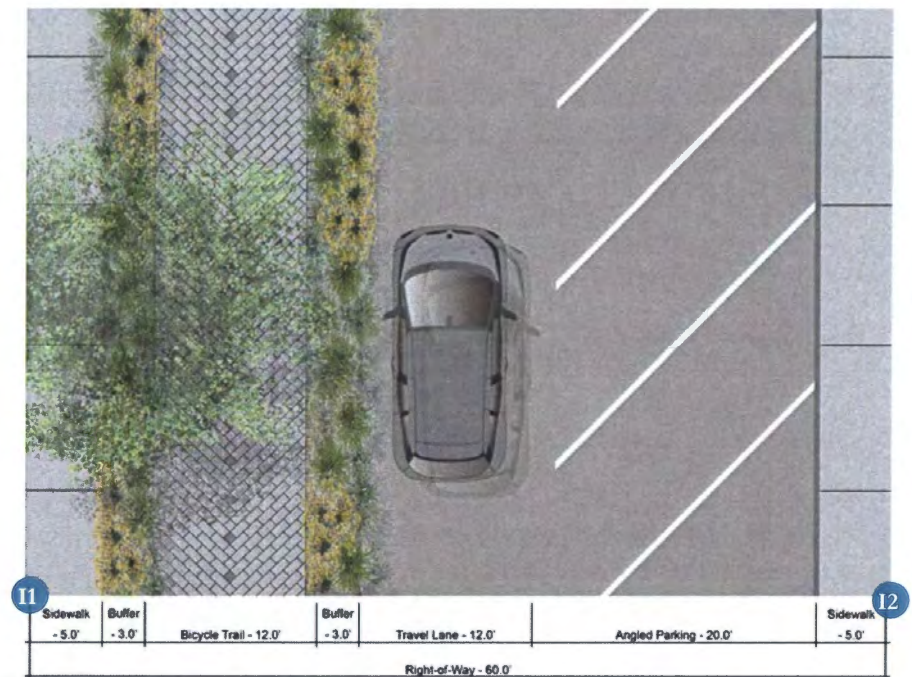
East 22nd Street between Chester Ave and Payne Ave Zoomed-In Plan
